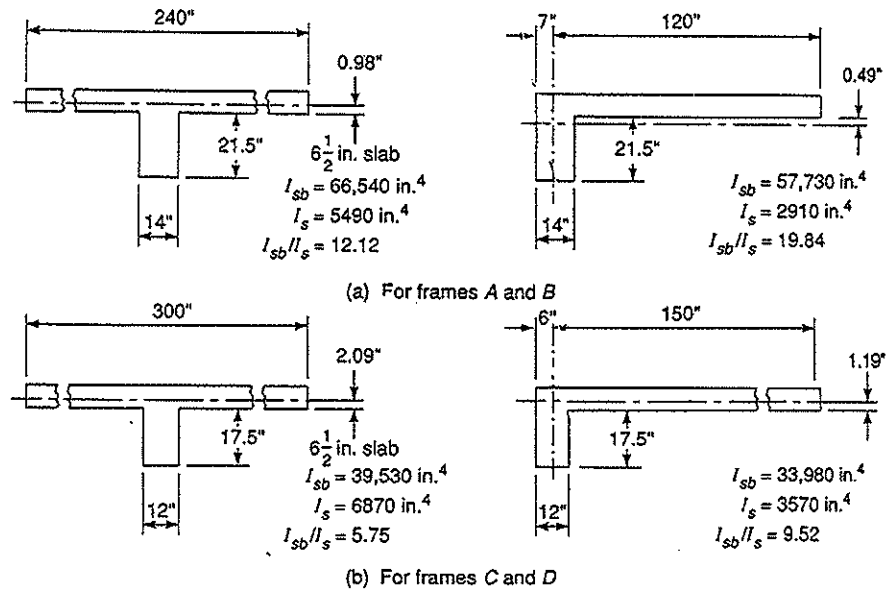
Slab-beam cross-sections in two-way slab (with beams) design example.
